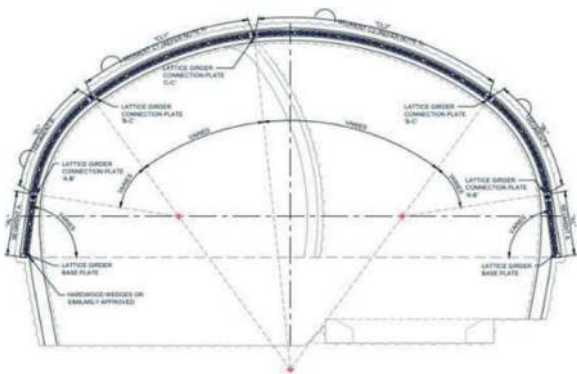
A typical section of the lattice girder setout for MC20/MC50 cavern.
